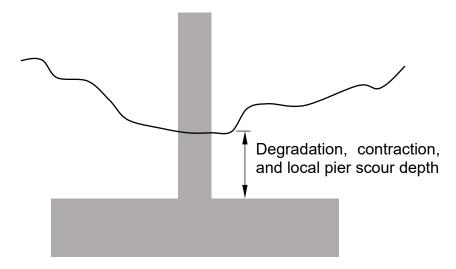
Minimum Embedment for Scour Protection
